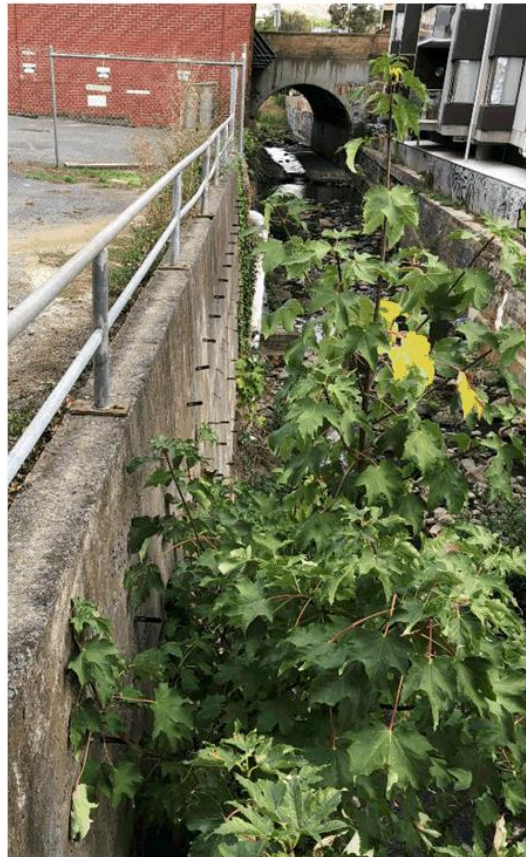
The rivulet retaining wall, looking towards the Molle Street Bridge.
